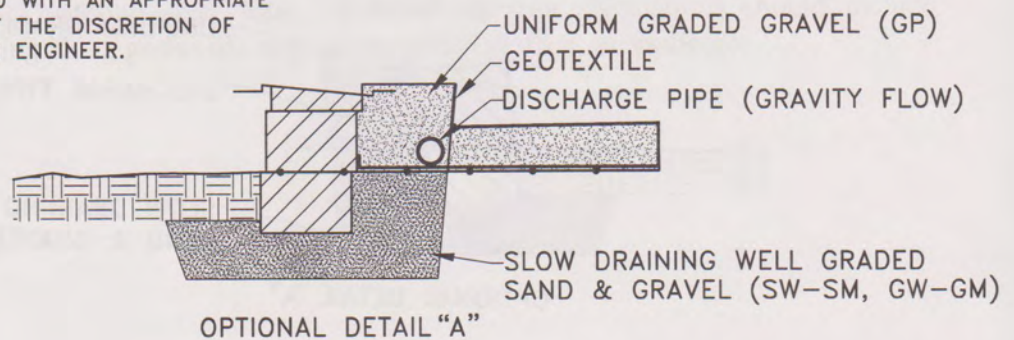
WALL FACE AND BLANKET DRAIN - CASE 2
